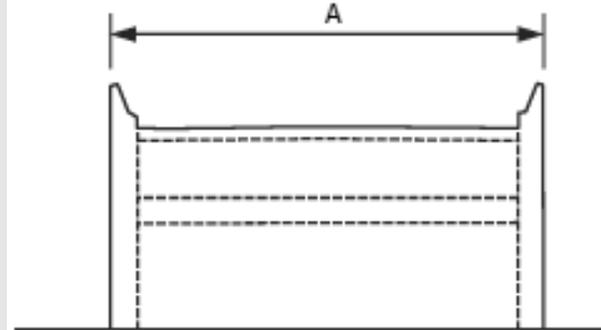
Cross-section view of a filled arch bridge or culvert under fill with headwalls.
